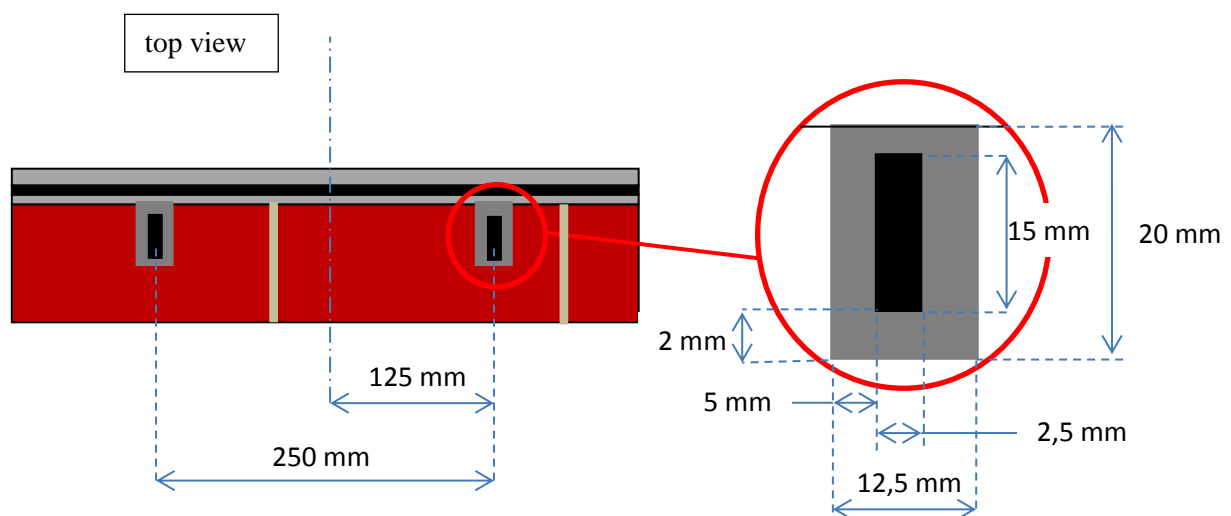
Top view of masonry wall sample (scale adjusted for illustrative purpose)
